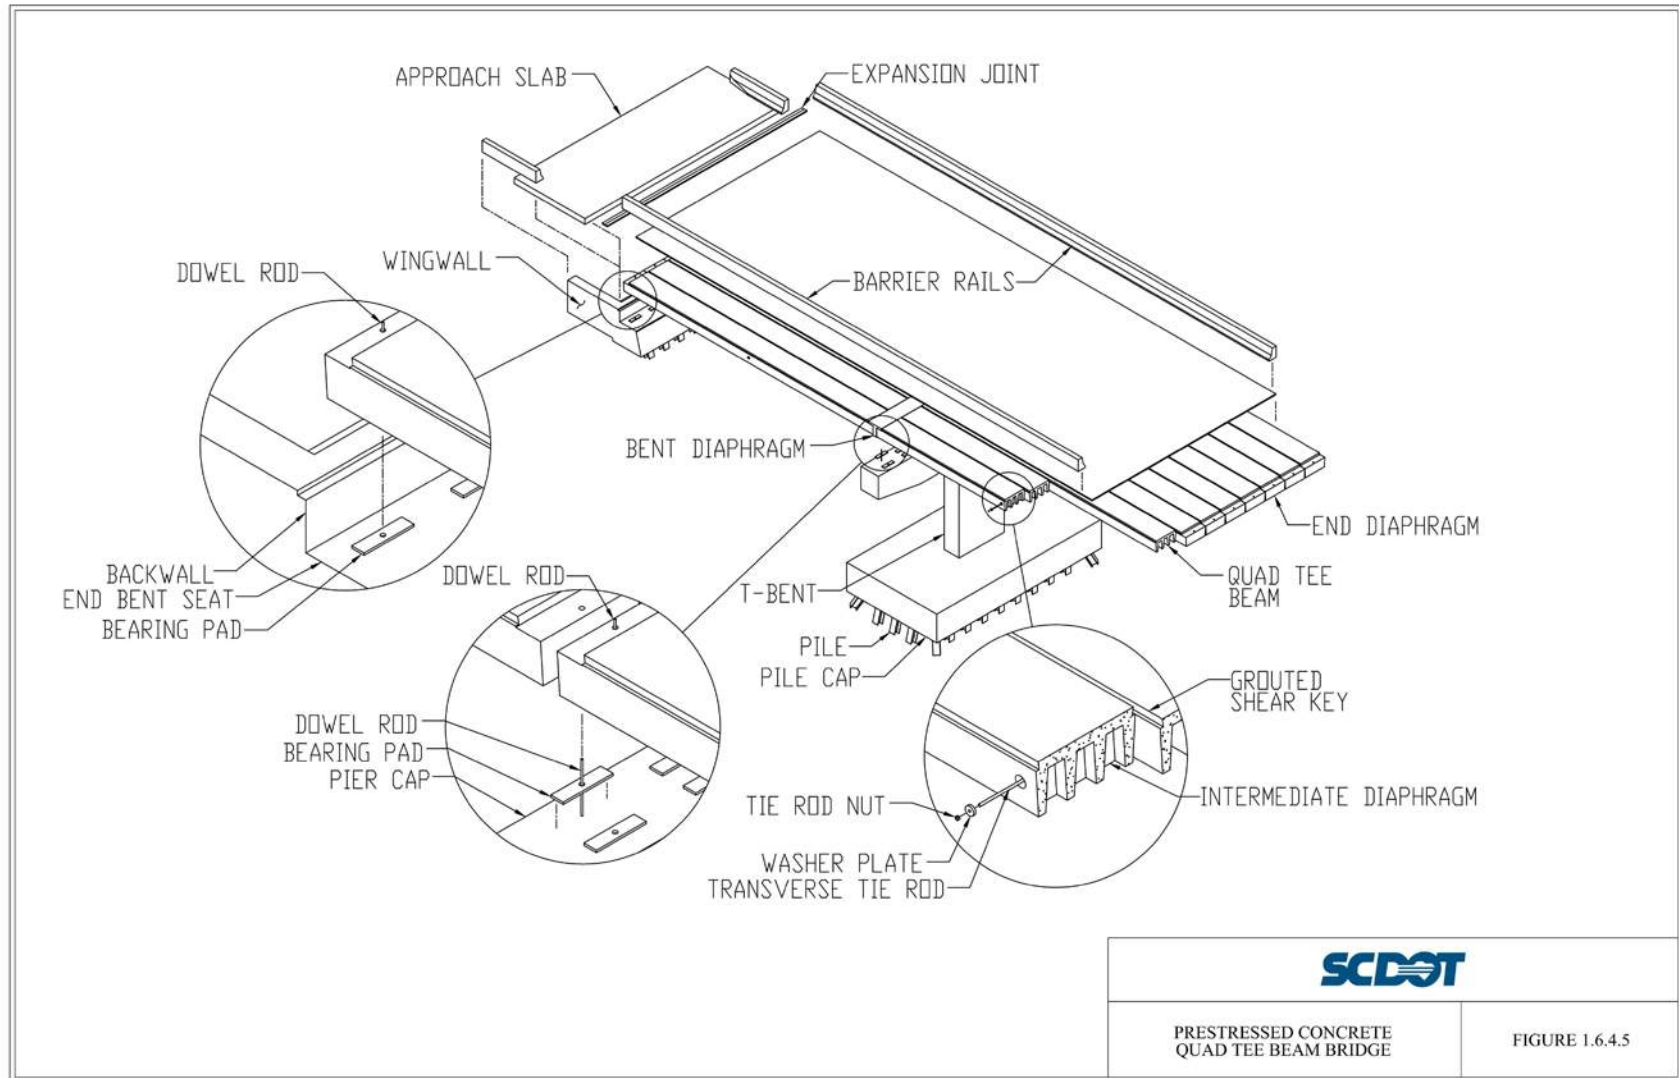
Prestressed Concrete Quad Tee Beam Bridge Components
